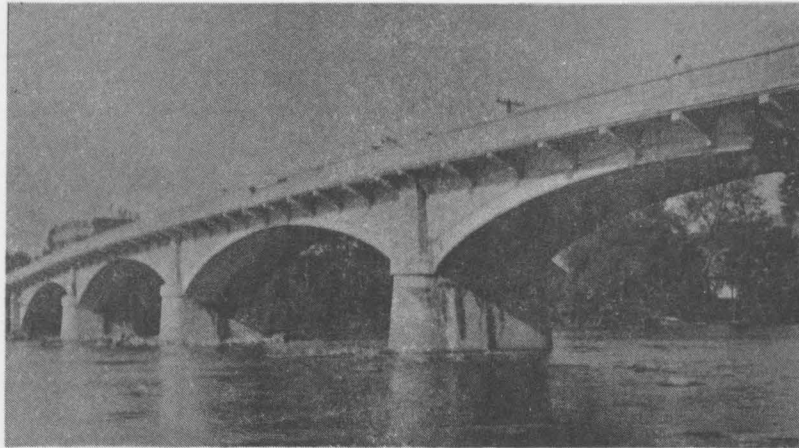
McEnteer's Alderson Bridge - McEnteer Collection
